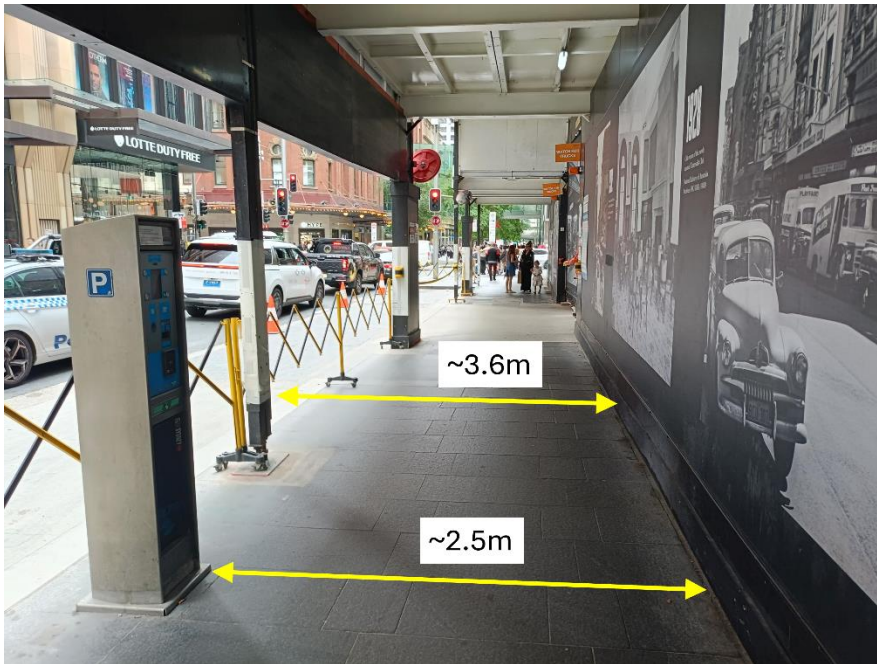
Castlereagh Street looking north, adjacent to proposed development site.
